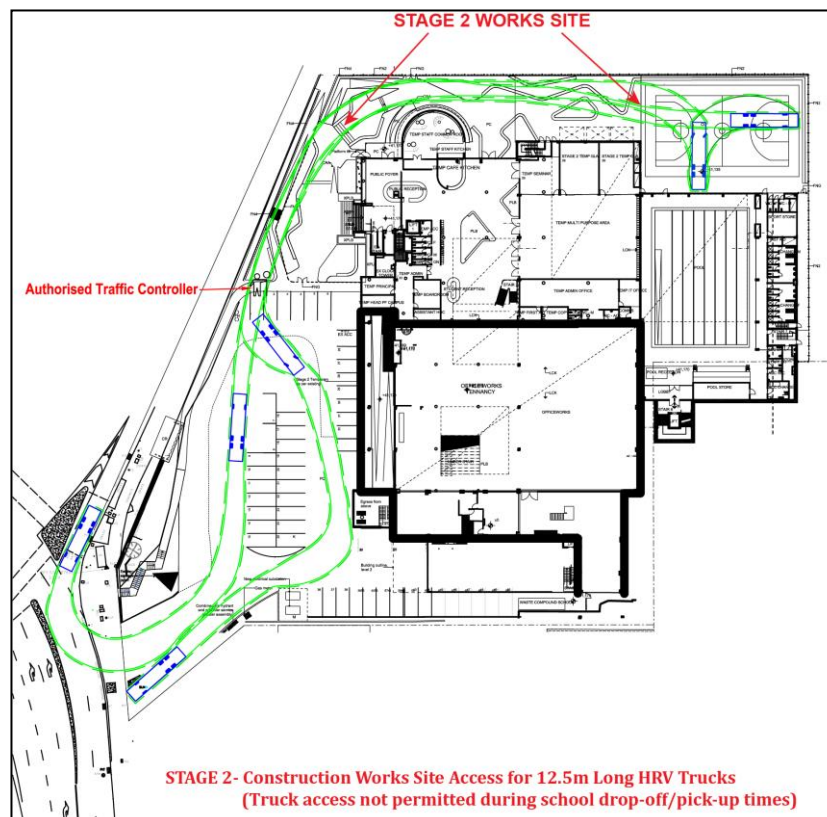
Stage 2 Construction Access for 12.5m Long HRV Trucks
